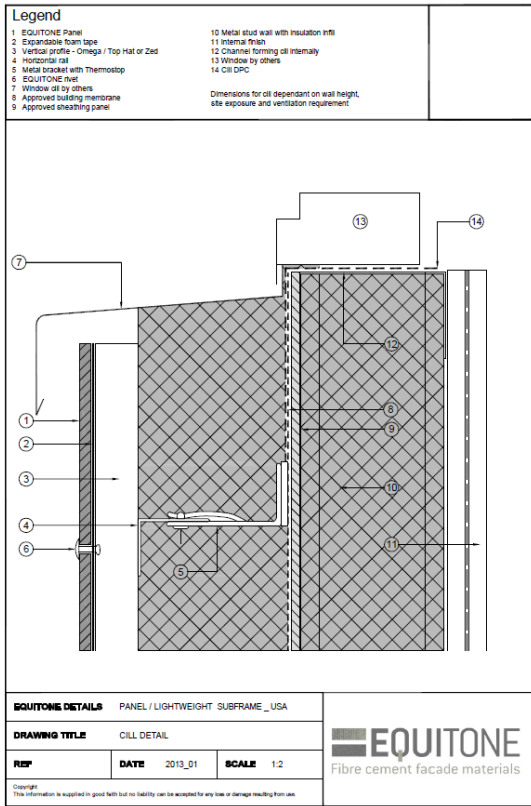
EQUITONE NATURA AND TECTIVE FIBER-CEMENT PANEL SYSTEM (TYPICAL INSTALLATION DETAILS)
